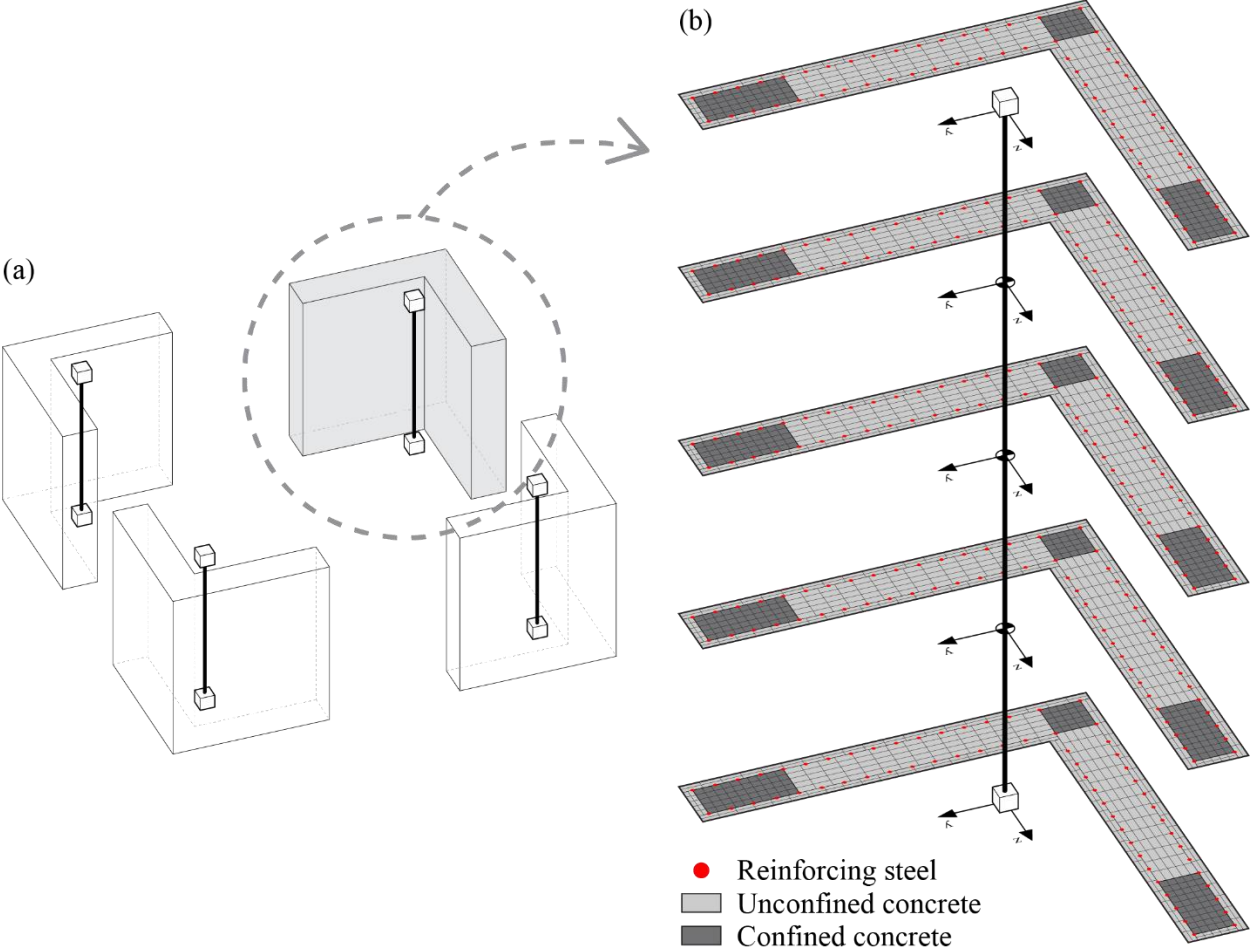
(a) Four core wall pier elements at a typical floor, and (b) one core wall pier element with fiber sections at 5 integration points
